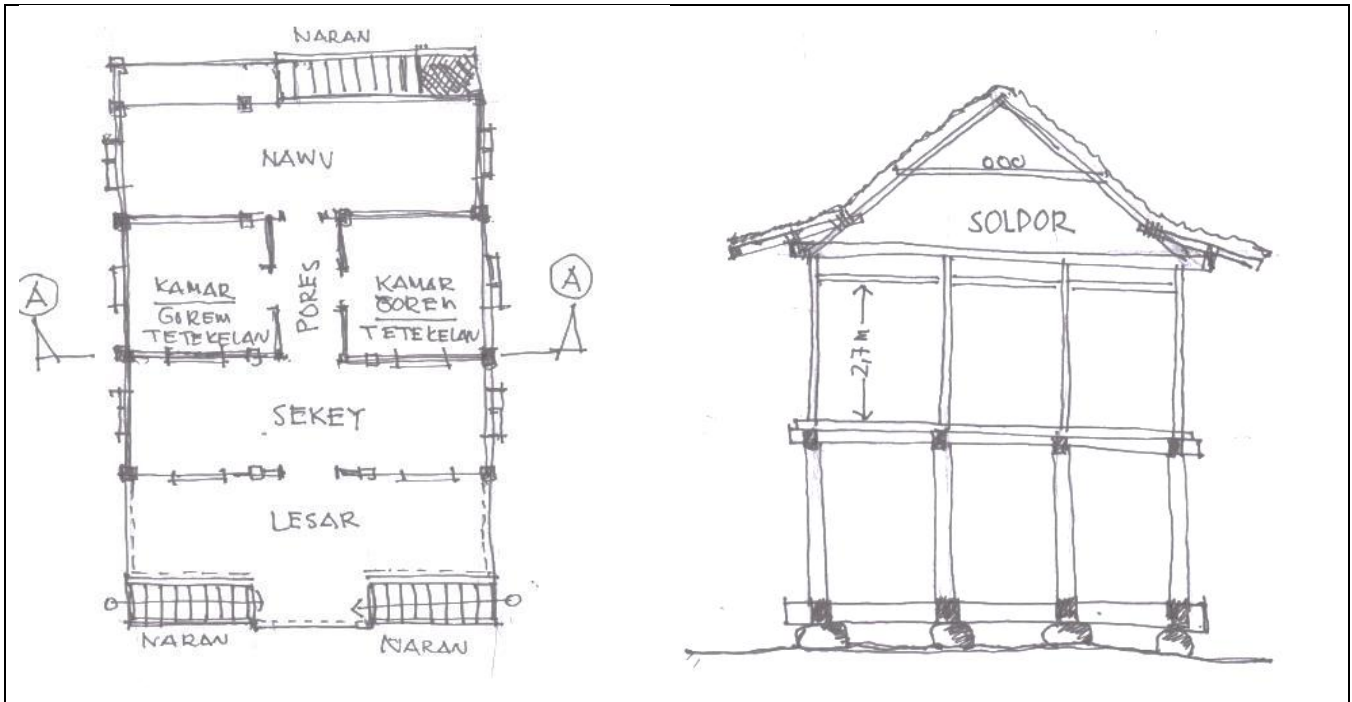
Typical Plots and Section of Minahasa Traditional House In Kampung Jawa Tondano
